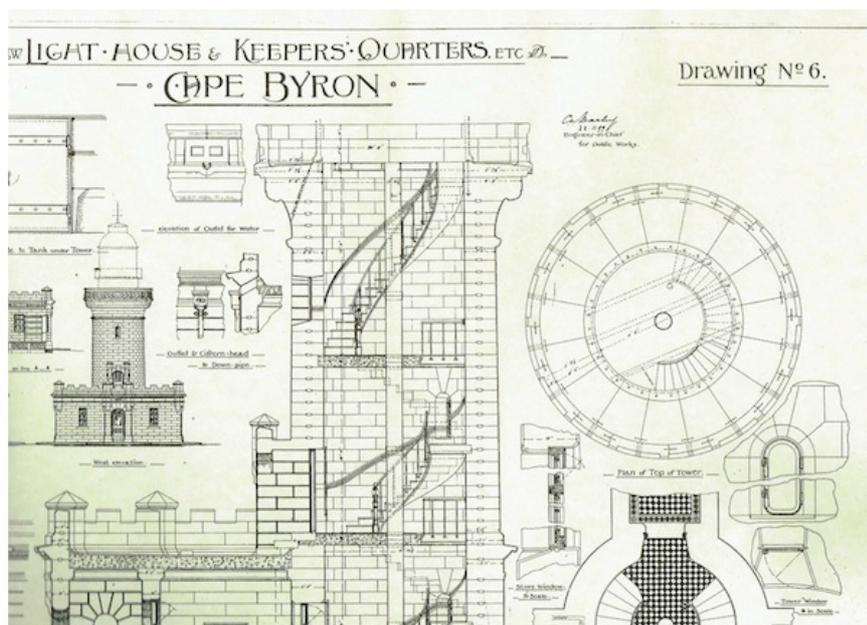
Cape Byron light house interior showing the circular stairwell, including side elevations and plan view of tower. (National Archives)
